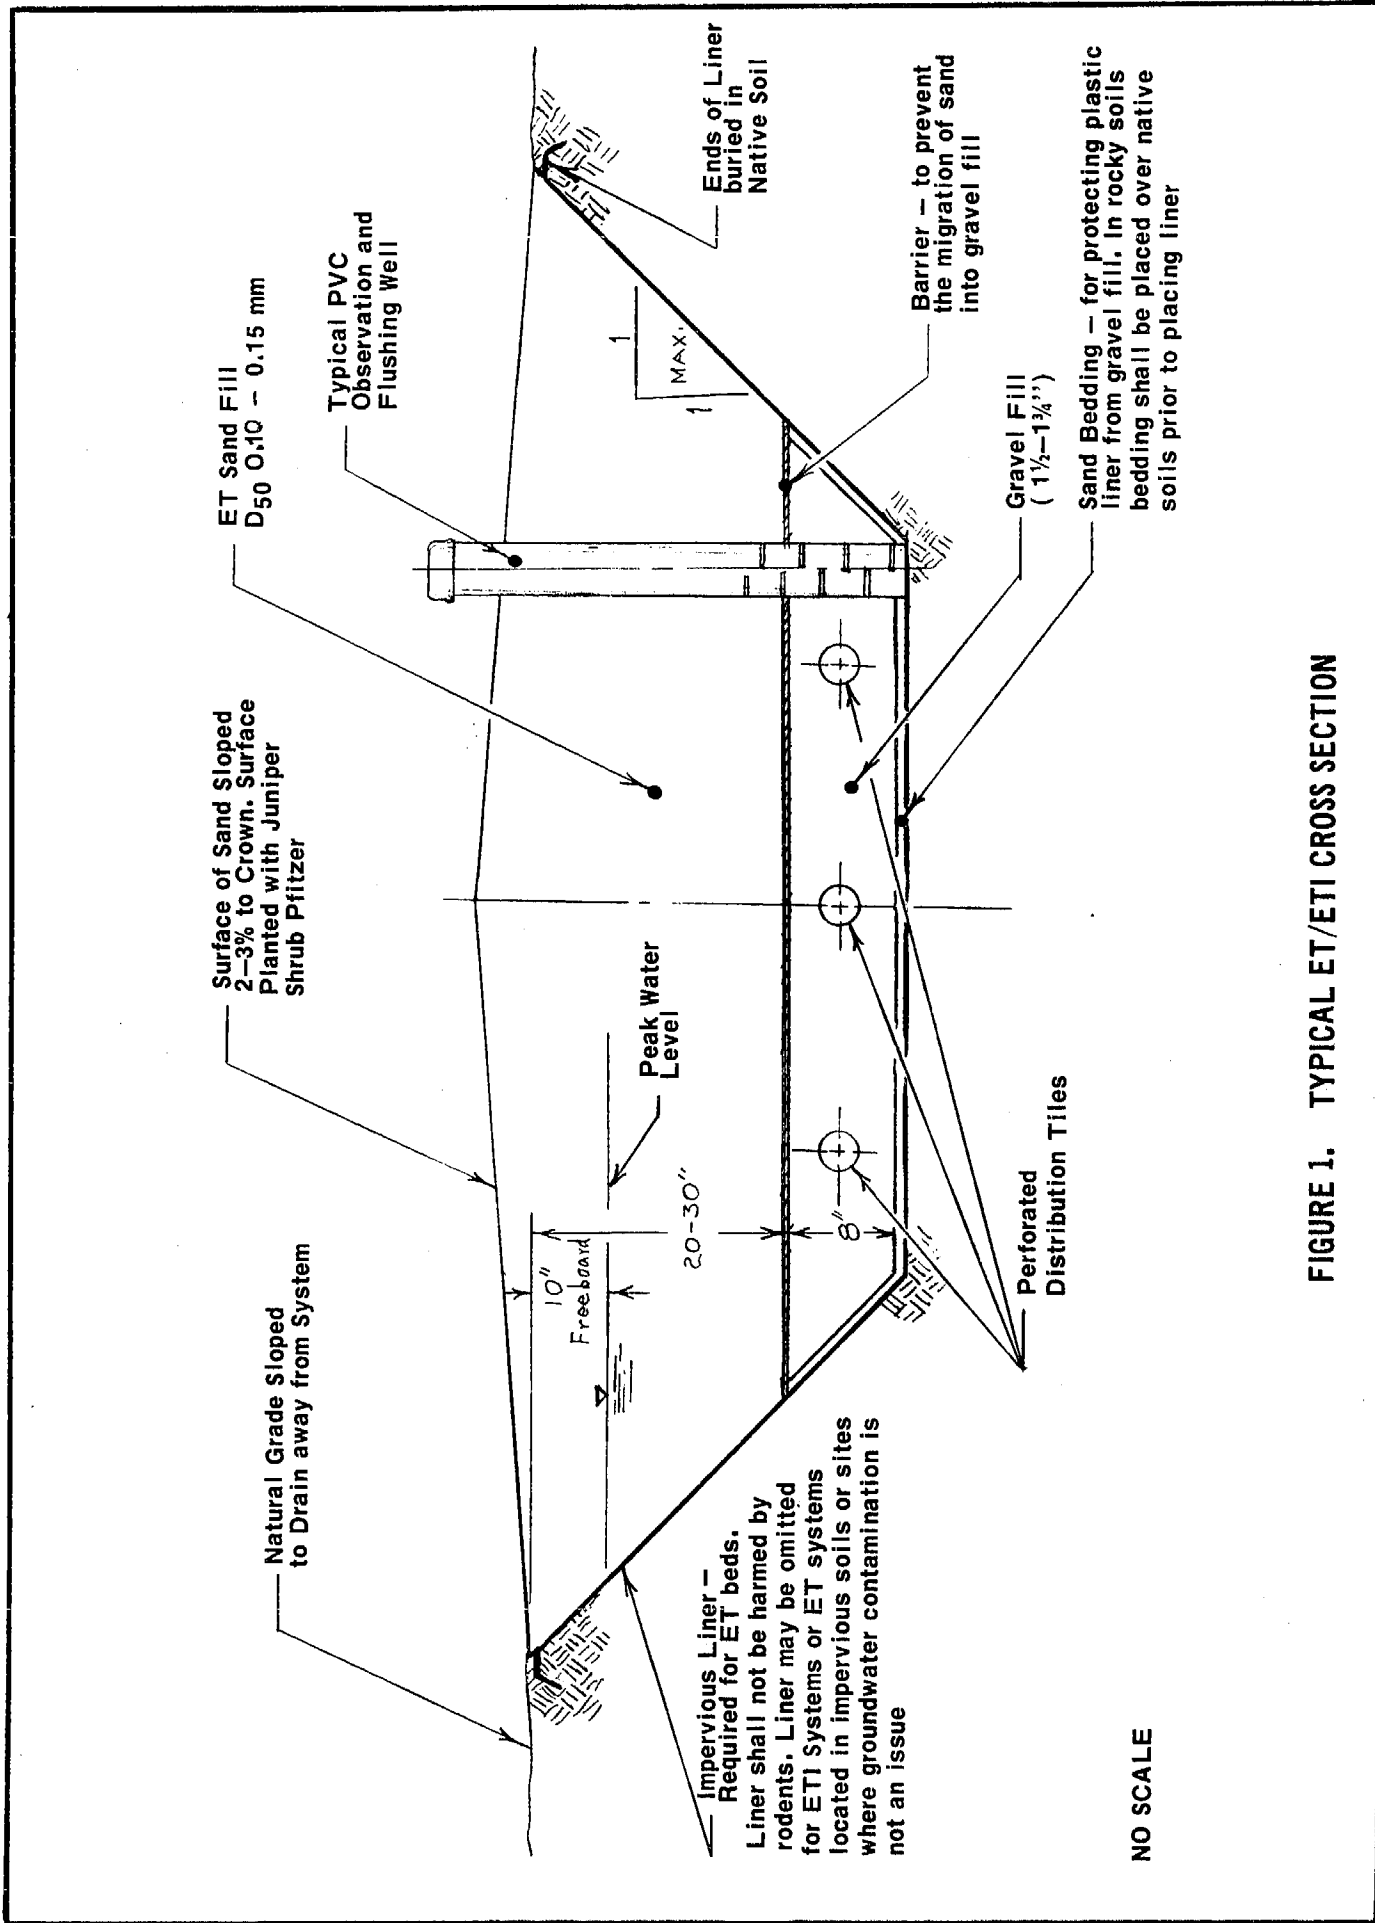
TYPICAL ET/ETI CROSS SECTION
